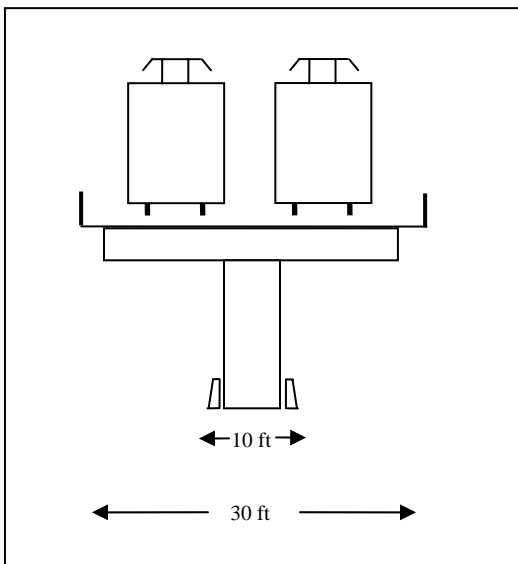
Elevated LRT (e.g., Pittsburgh, PA)
